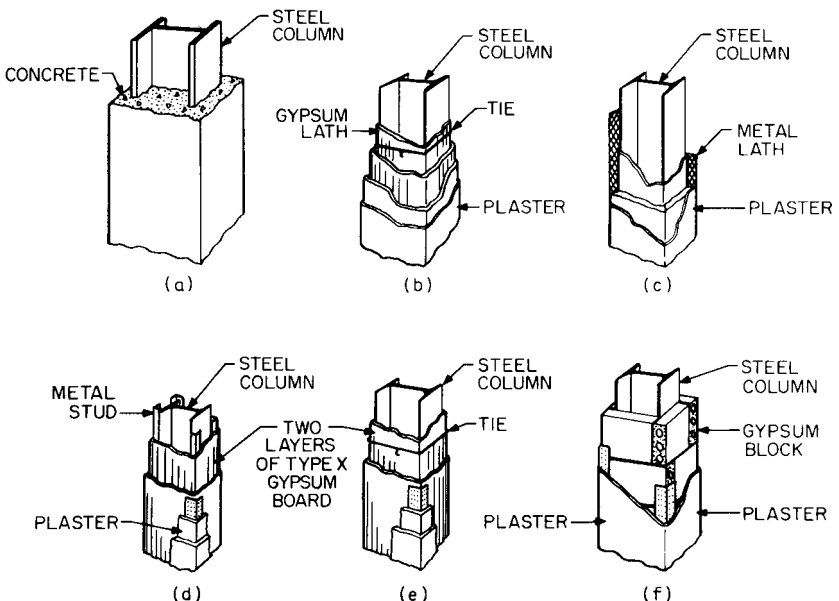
Fire protection of steel columns by encasement with (a) concrete, (b) plaster on gypsum lath, (c) plaster on metal lath, (d) furring and gypsumboard, (e) gypsumboard without furring, and (f) gypsum block and plaster.
